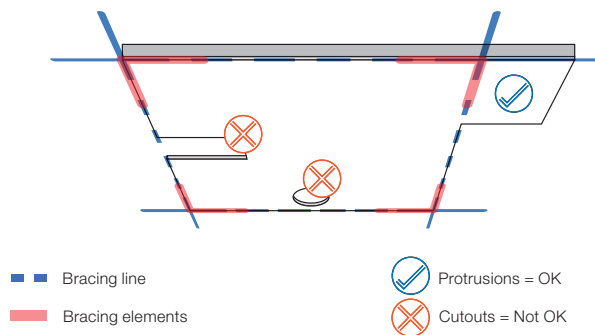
DIAPHRAGM BRACING LINING SPACINGS
